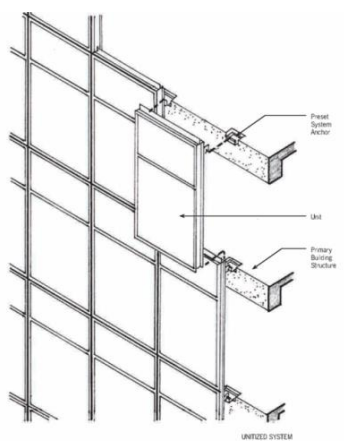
The unitized façade system will be integrated into the overall phasing plan for the upper floors of the building.⁵
